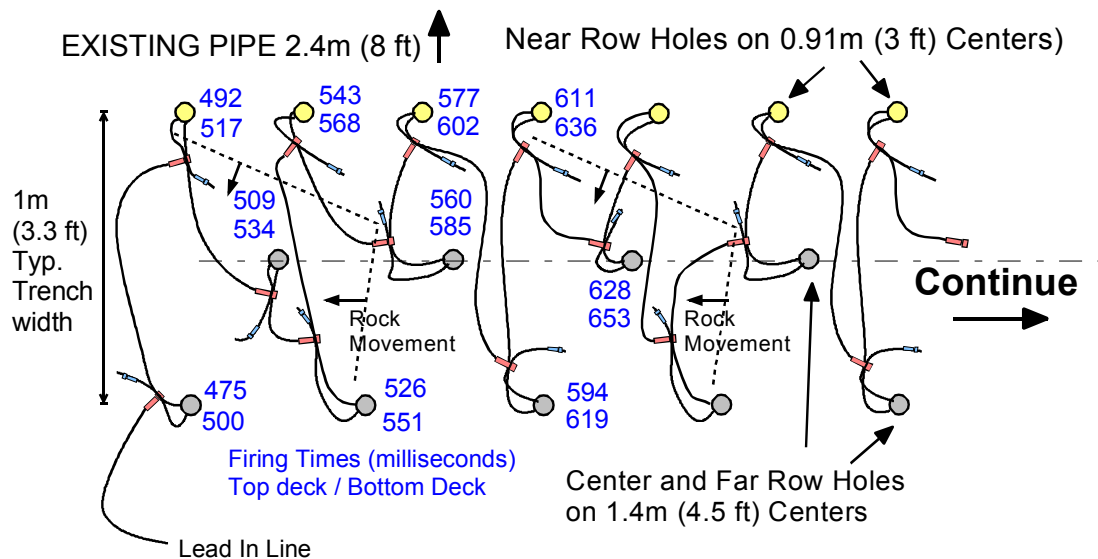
Drilling Layout and Delay Timing for Blast near Existing Water Pipe
